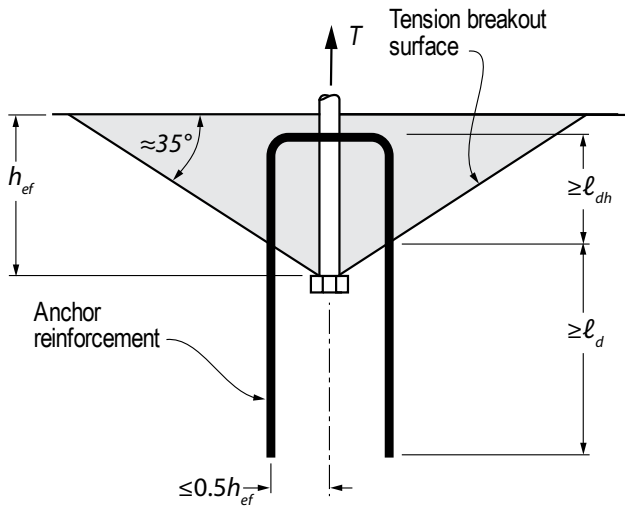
Anchor reinforcement for tension, where h_{ef} is the effective embedment depth of the anchor (Note: T is the tension force acting on the anchor or anchor group; l_{dh} is the development length in tension of a deformed bar with a standard hook; and l_d is the development length in tension of a deformed bar)
